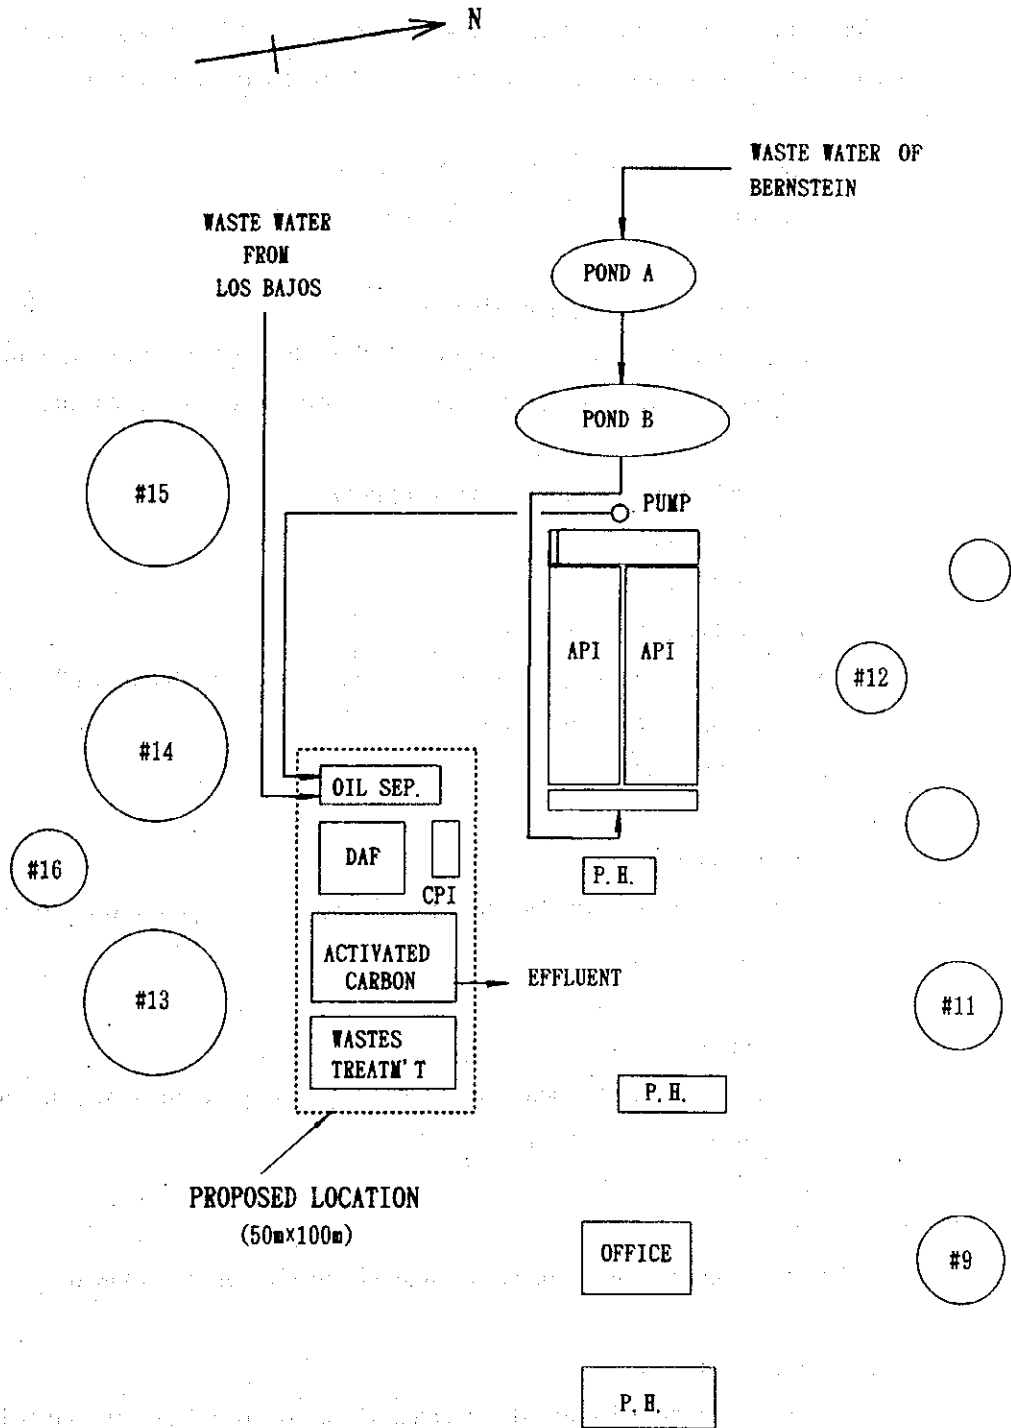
Plot Plan of the Waste Water Treating System (Bernstein)
